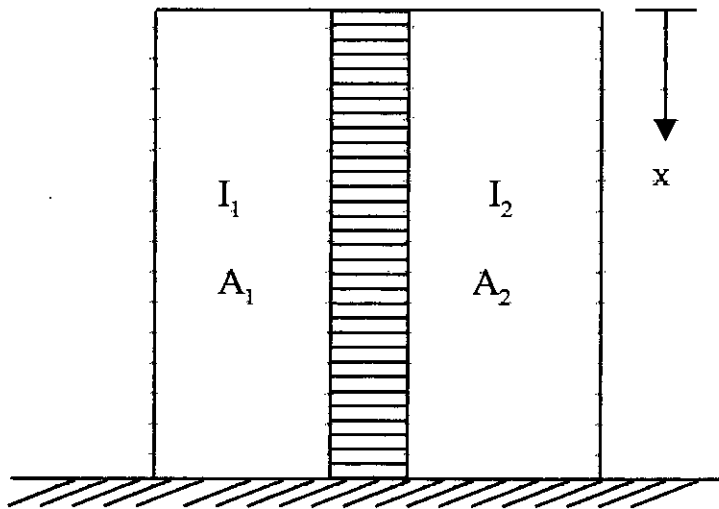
Shear wall with idealized continuous connection of laminae.
